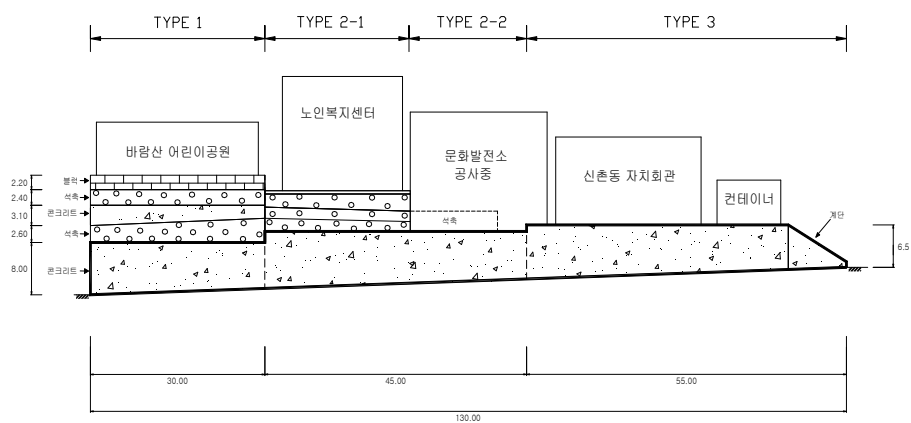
is an elevation profile of the road section. The vertical axis on the left shows elevations from 8.0 to 24.2 meters. The profile includes a road surface, a sidewalk, and a building labeled '바람산 어린이공원' (Bamsan Children's Park). Dimensions are given in meters (m).
